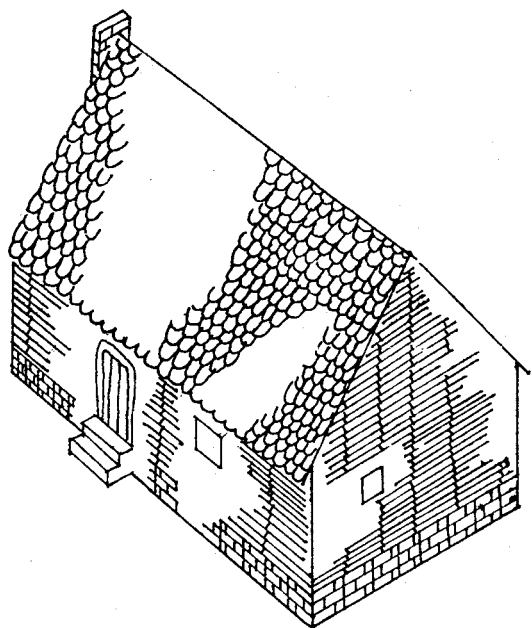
Reconstruction of the Flowerdew Hundred house with bricked-in cellar, chimney, and roofing tiles.
